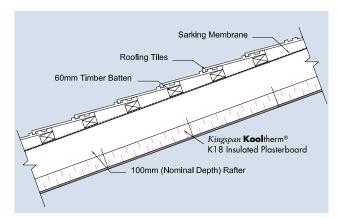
Side elevation - Raked ceiling with Kingspan Kooltherm® K18 Insulated Plasterboard
